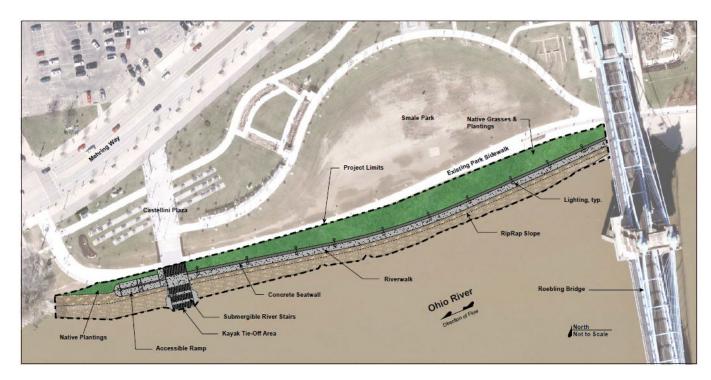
Alternative 2- Hardscaped Shoreline with Pedestrian Access and Stairs to Ohio River
